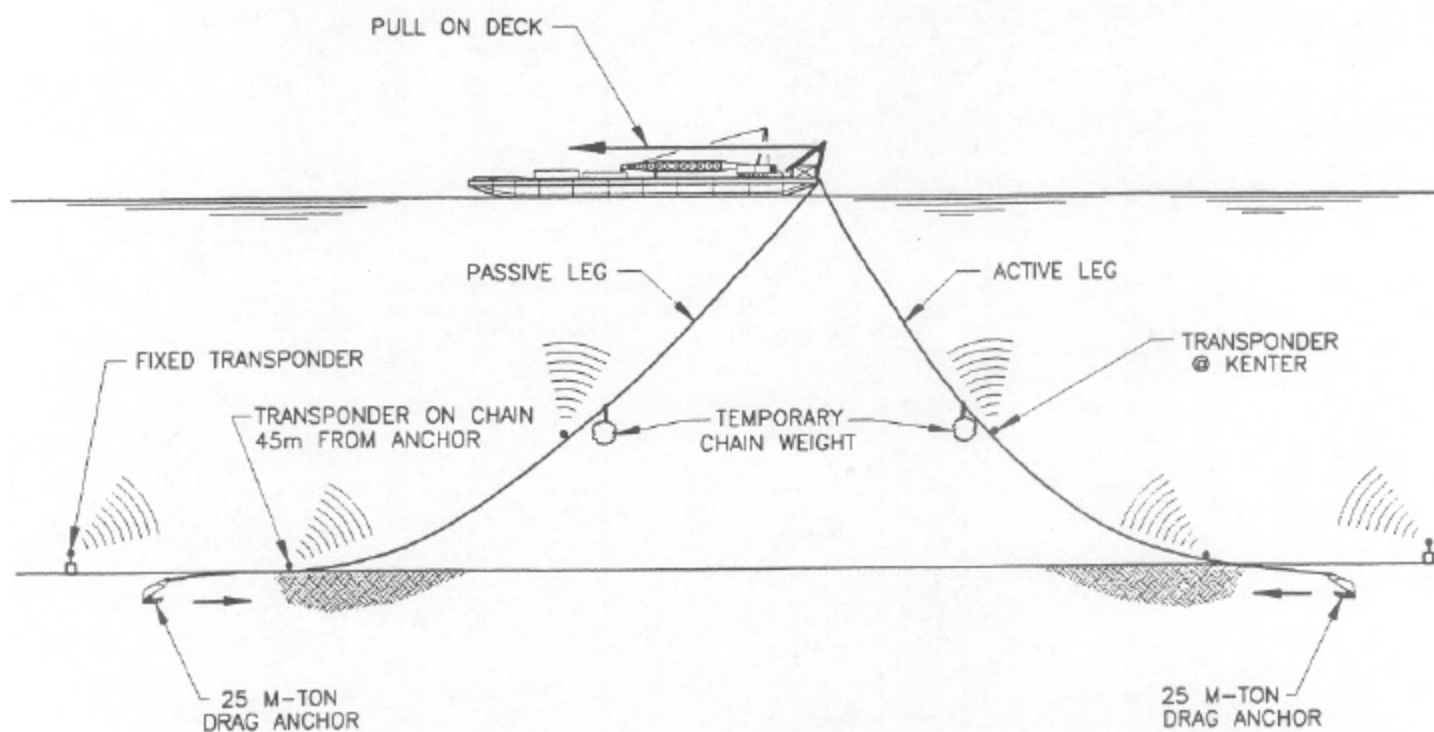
GENERAL PROOFLOADING ARRANGEMENT
